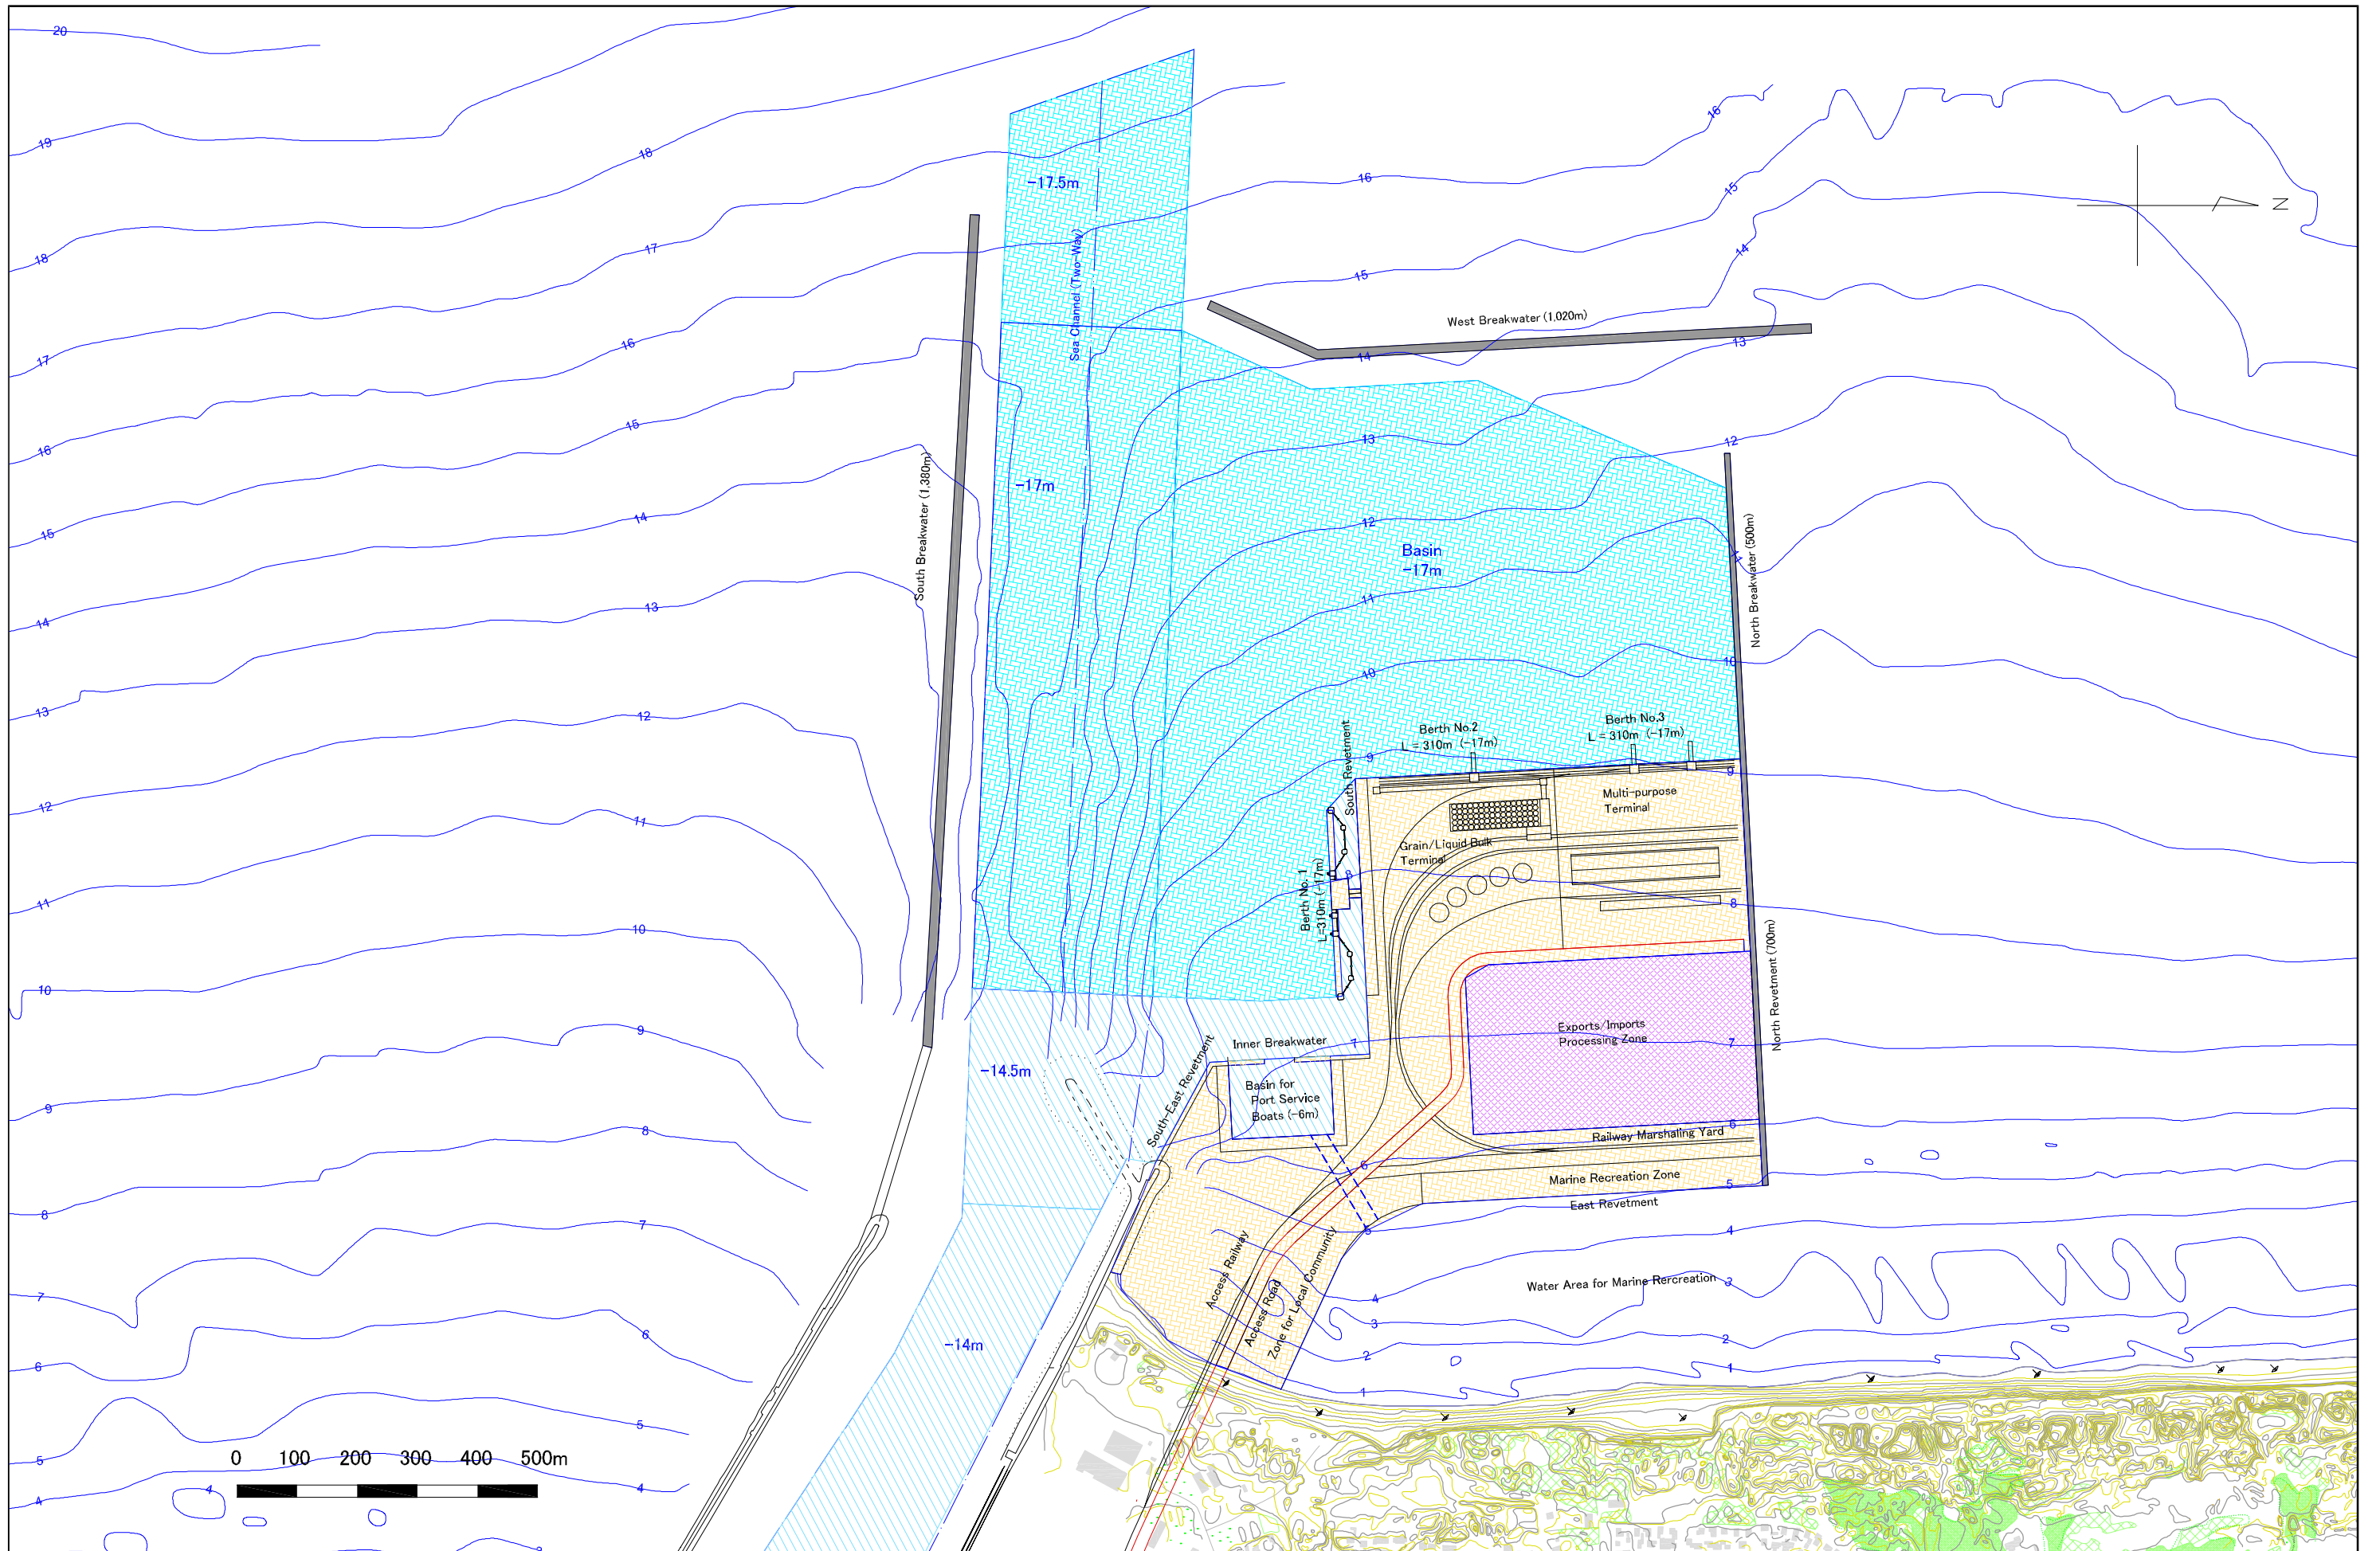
Facility Layout Plan of Outer Port in Short-Term Plan
